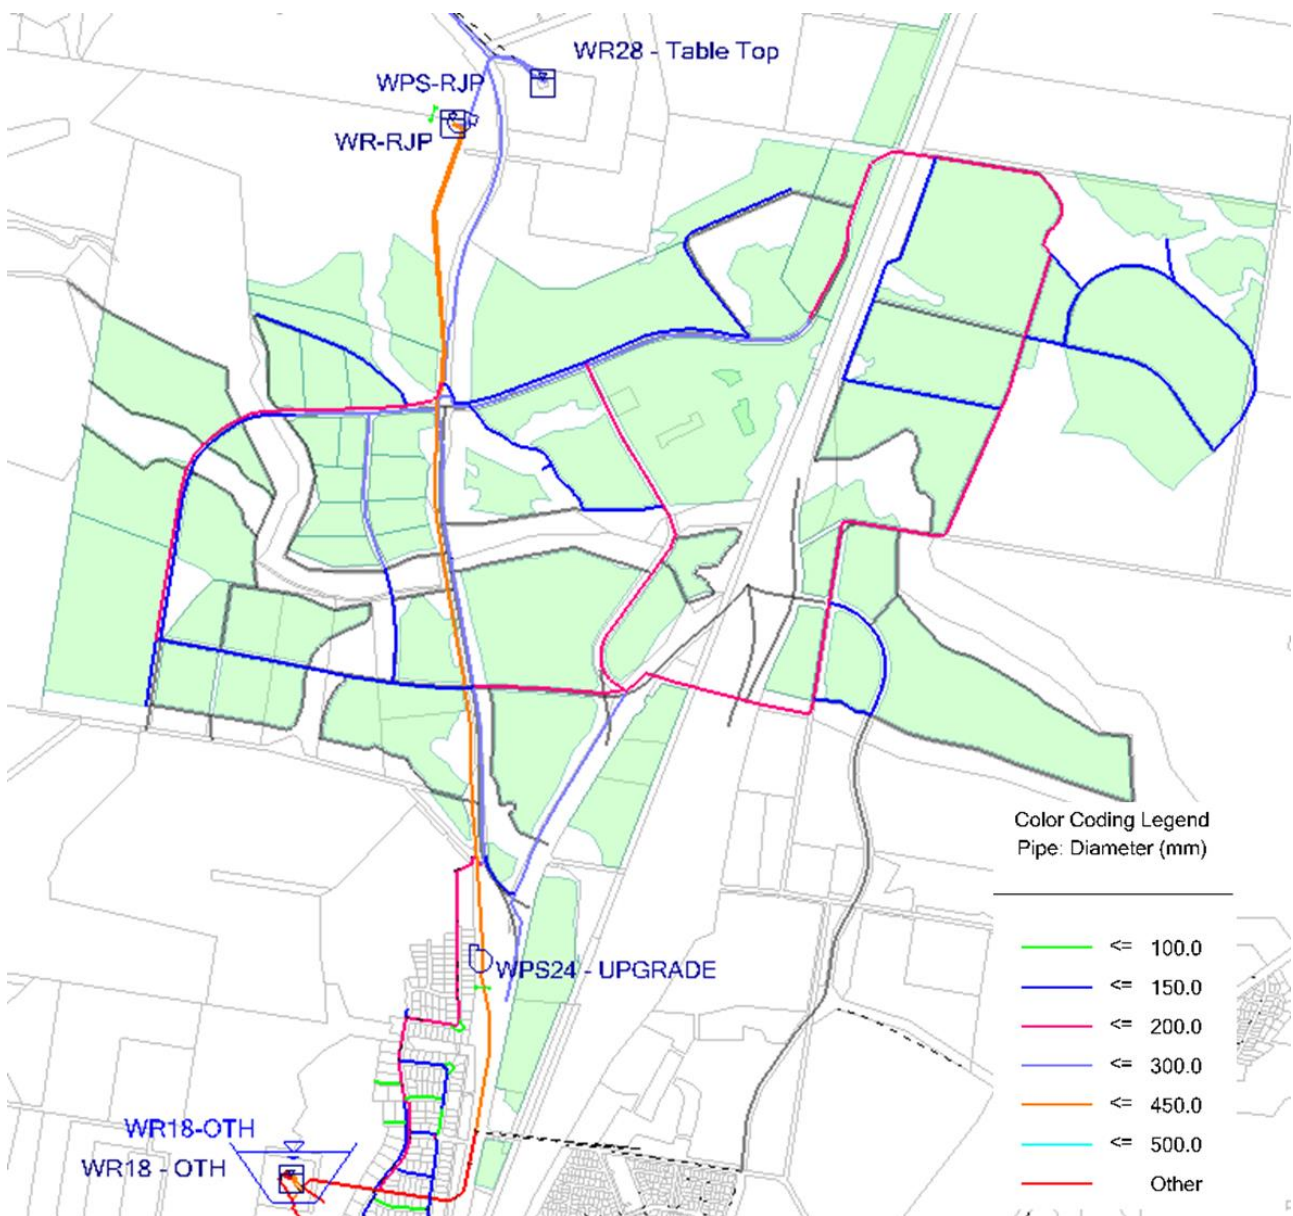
| Proposed Water Reticulation Network – New & Existing Pipes
